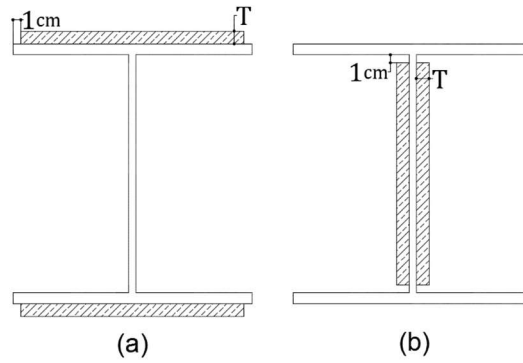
Details of externally welded steel plates to frame elements: a) beams b) columns
